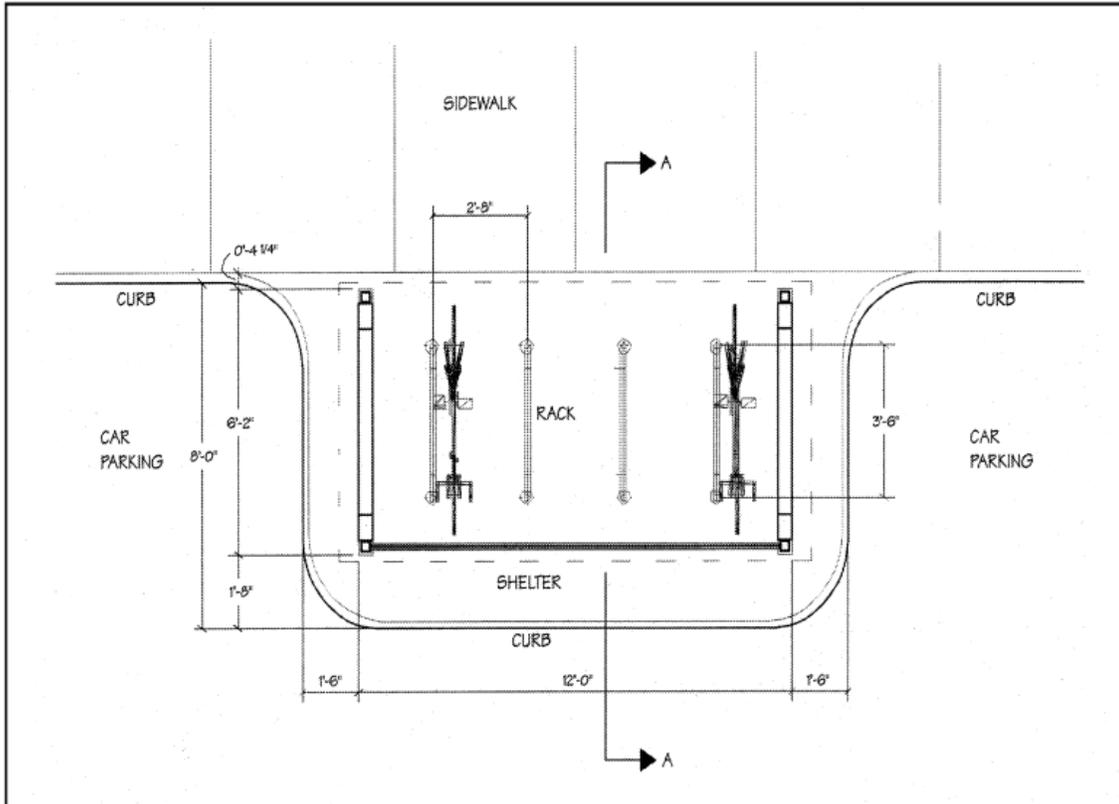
Plan of Proposed Mid-Block Curb Extension with Sheltered Bicycle Parking
